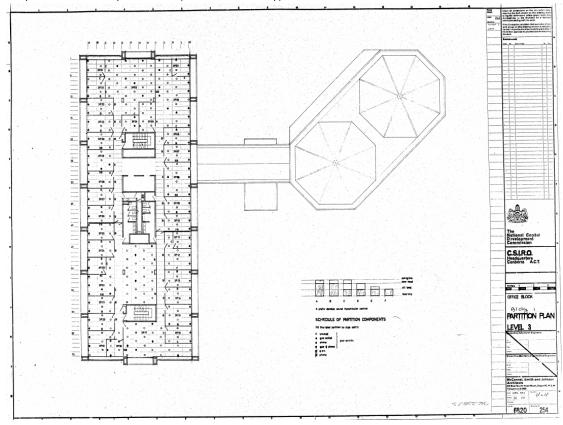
Original architectural drawings of Level 3 of Building 1, with the partition wall schedule (Source: DOMA Group)
